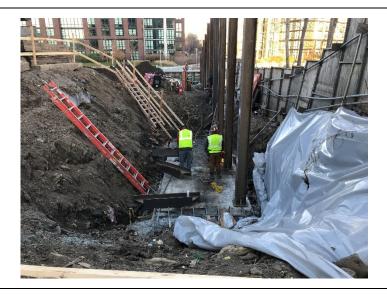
Facing northeast, Land and Sea Construction Corp. imports $#57 - \frac{3}{4}$ " crushed stone to be used as backfill at the bulkhead up to elevation +3.5 ft NAVD88.
